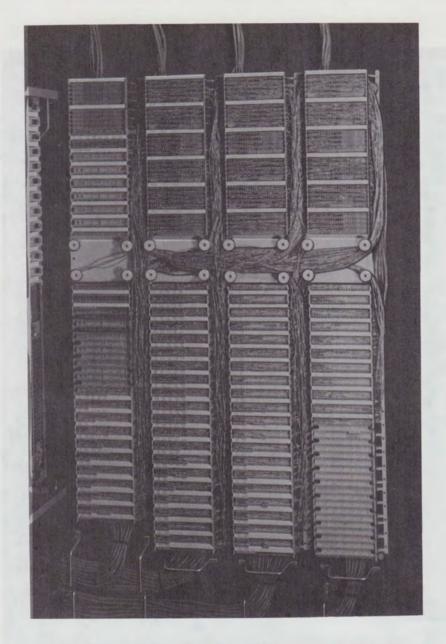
Typical Apparatus Closet Arrangement Using 88-Type Wiring Blocks
